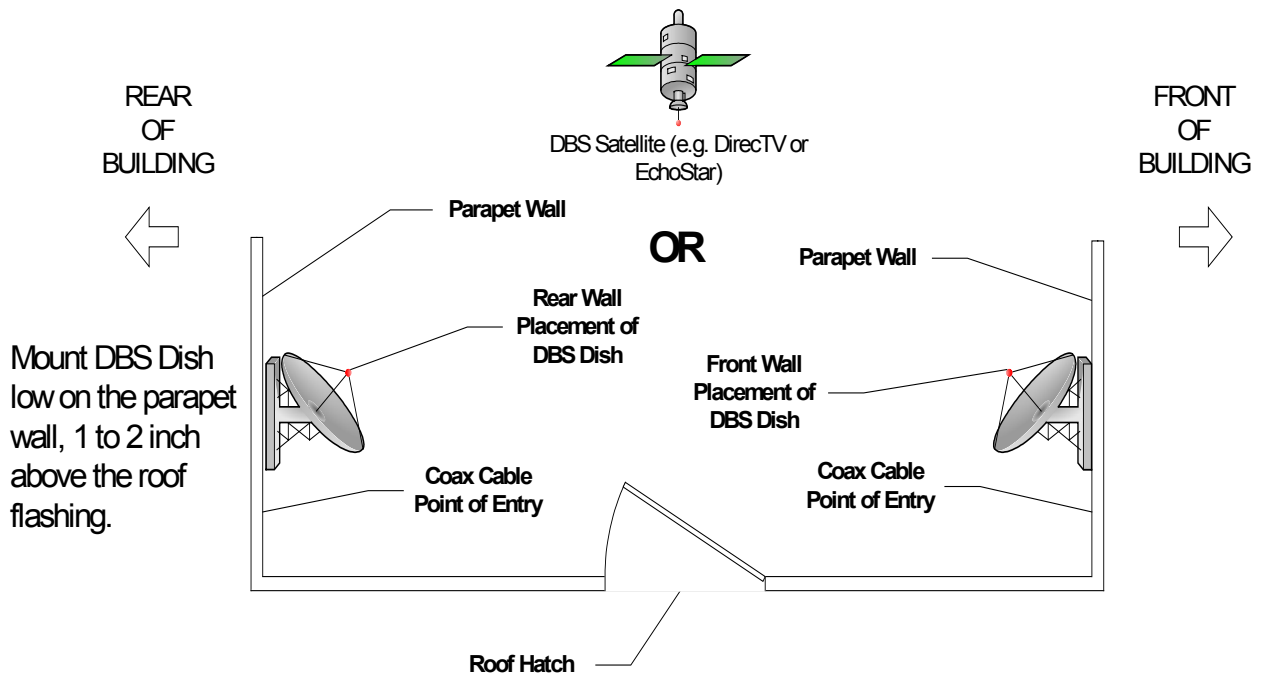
Placement of DBS Antenna on Parapet Wall, Flat Roof Common Area
